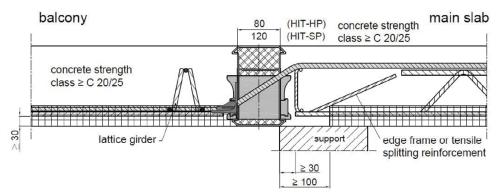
Example of the connection HIT-HP/SP ZVX to element slabs with statically effective in-situ layer
